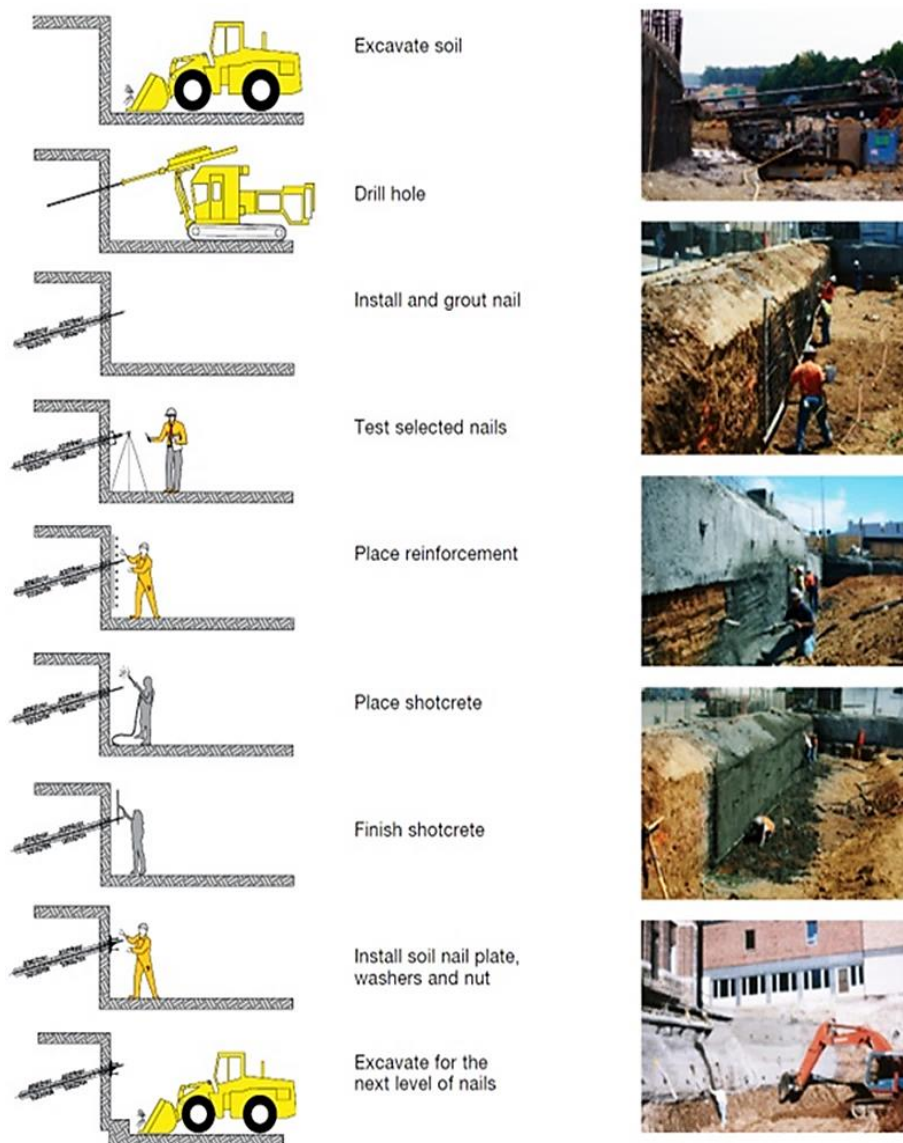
Soil nail wall construction sequence (Liu Jinyuan, HIFP-120, 2014)
